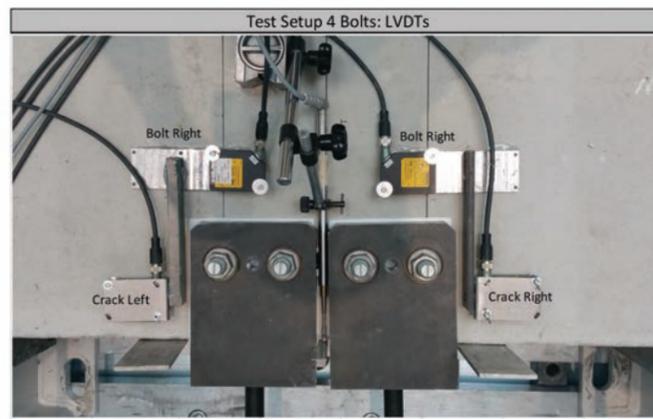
Test Setup 4 Bolts: LVDTs.
